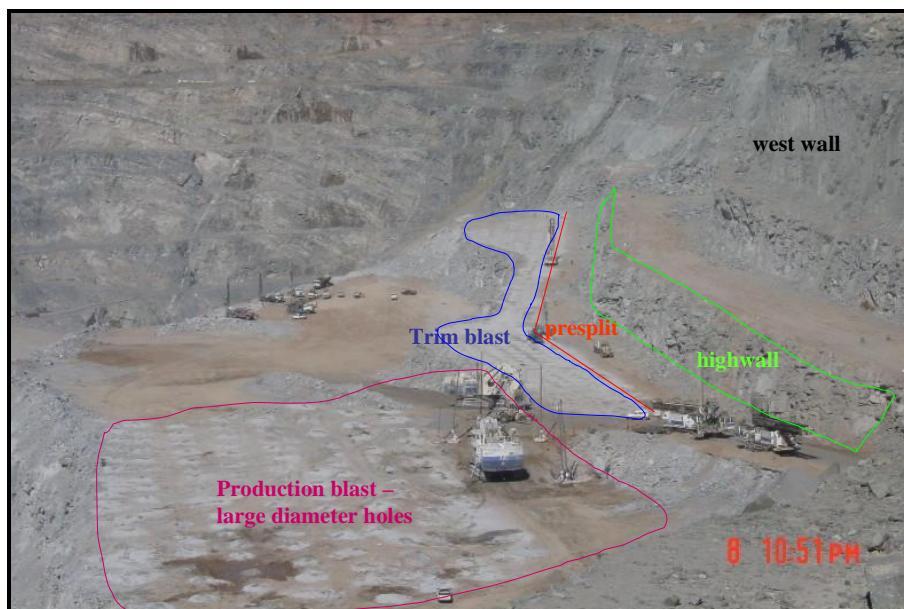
Photograph of a production shot, trim, presplit and the adjacent highwall in Sandsloot pit
